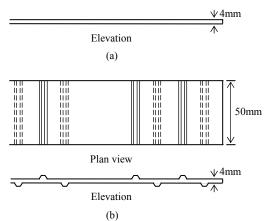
(a) Smooth reinforcement (b) Highly adherent (H.A.) reinforcement.
